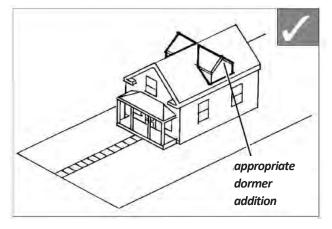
When adding dormers to an existing roof, it should be in scale and character with the primary structure.
